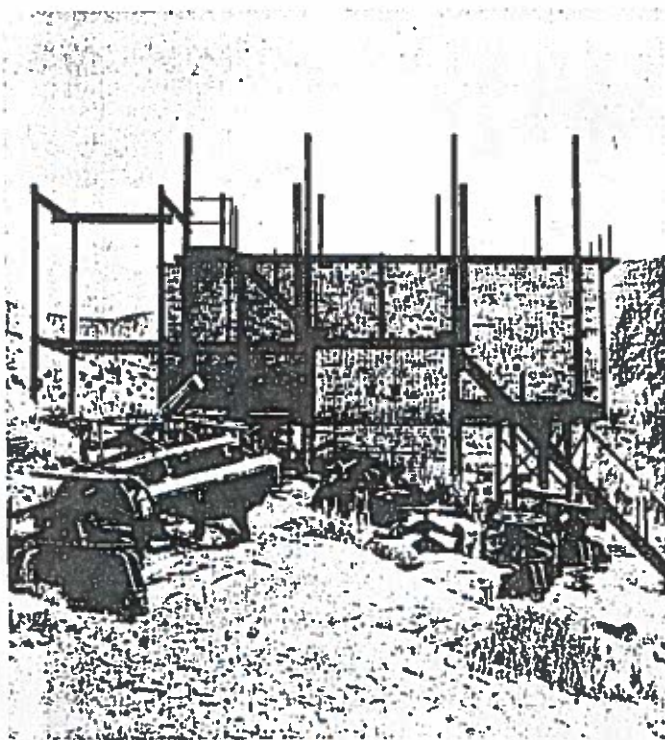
Ute oil shale plant, under construction in 1920 on White River south of Bonanza, Uintah County, Utah. Never completed.
